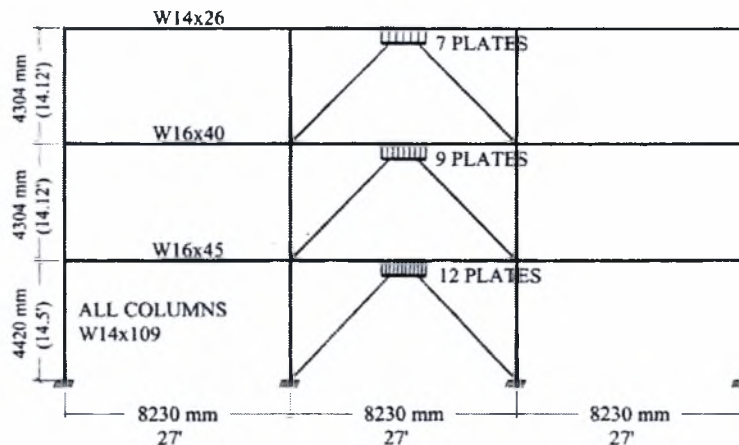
(b) 3- story building equipped with steel yielding dampers ( from Ramirez et al. 2002)
